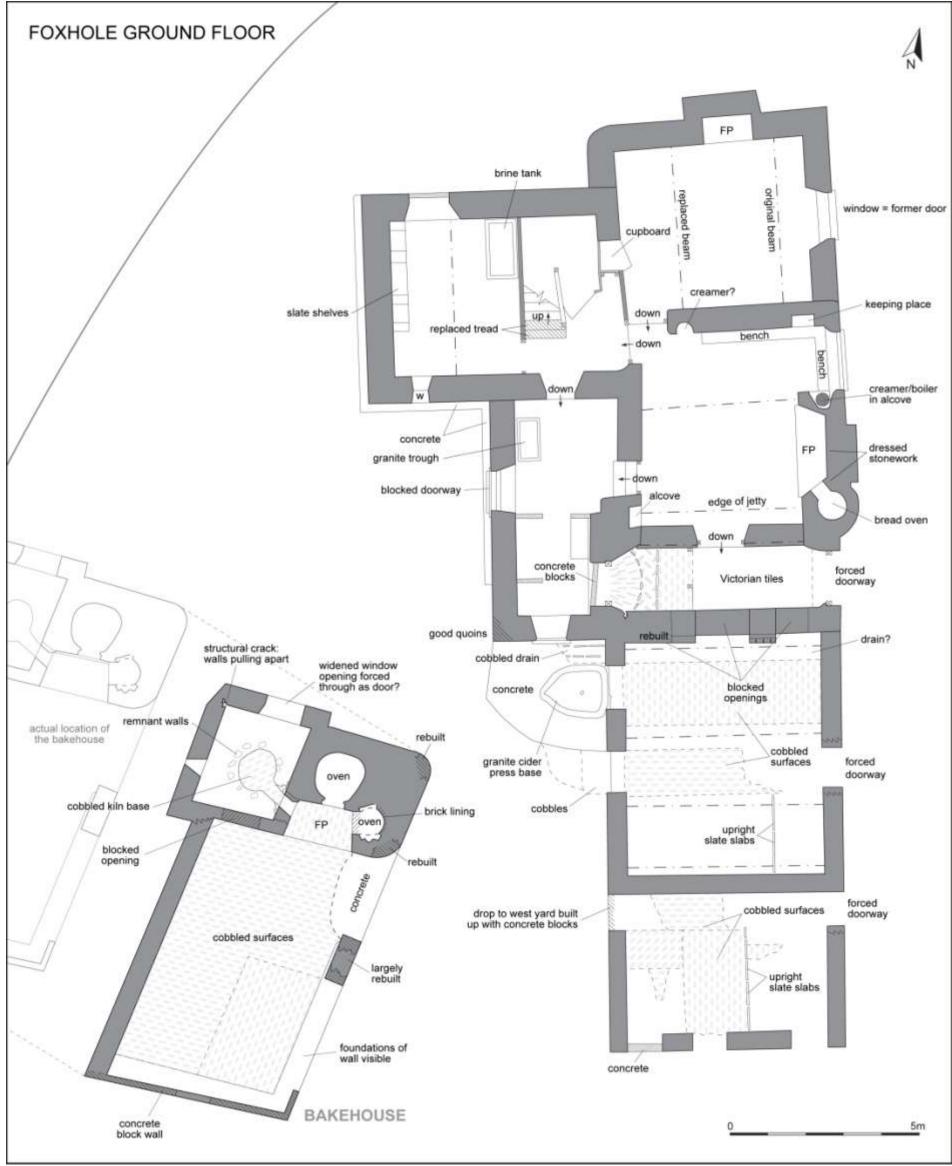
ANNOTATED GROUND FLOOR PLANS OF THE HOUSE AND BAKEHOUSE.
